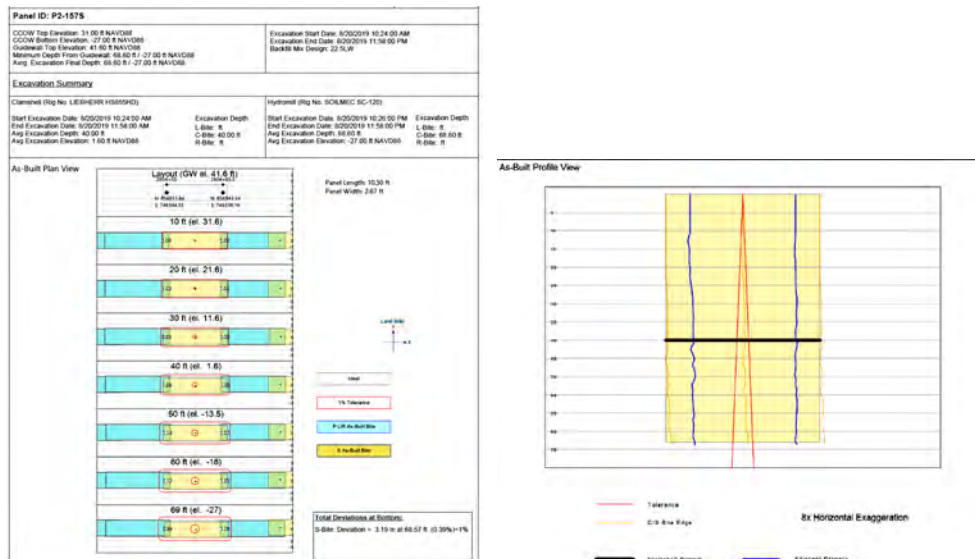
Element Report showing as-built position and overlap of diaphragm wall panel
